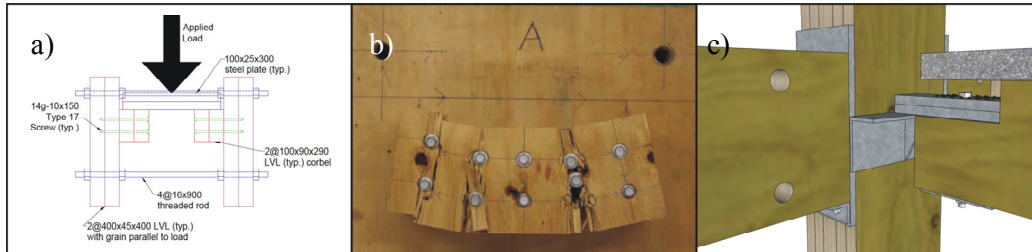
a) Timber corbel test set-up and b) response (Carradine et al. 2010) c) application of steel corbel in reconstructed building
